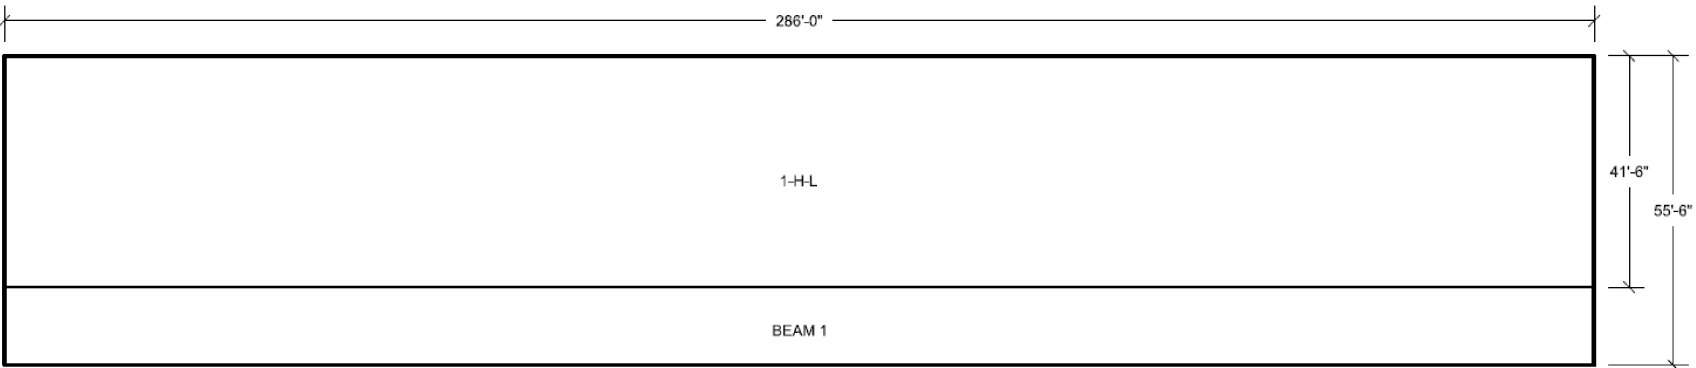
H.6-108 Cooling Tower North (and South) Wall Looking South (North)
